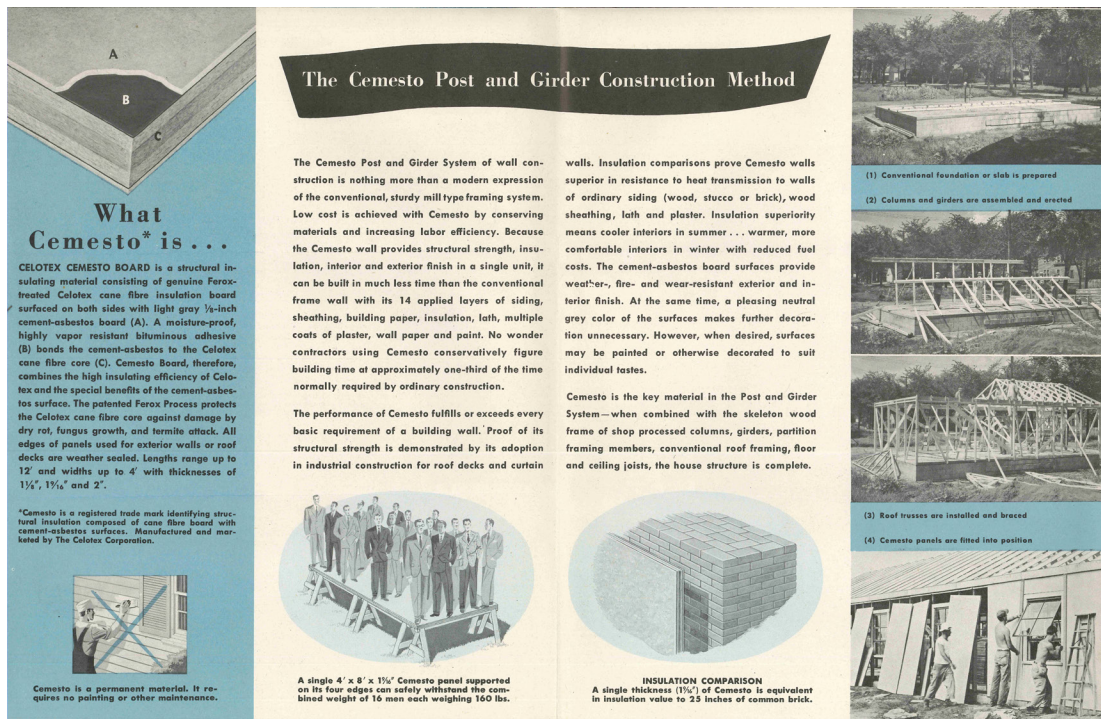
Advertisement from a Celotex Corporation catalog detailing the construction of a Cemesto and wood frame house (Celotex Corporation 1940). Courtesy of Stock Plan Books Collection, Northwest Architectural Archives, University of Minnesota Libraries.
